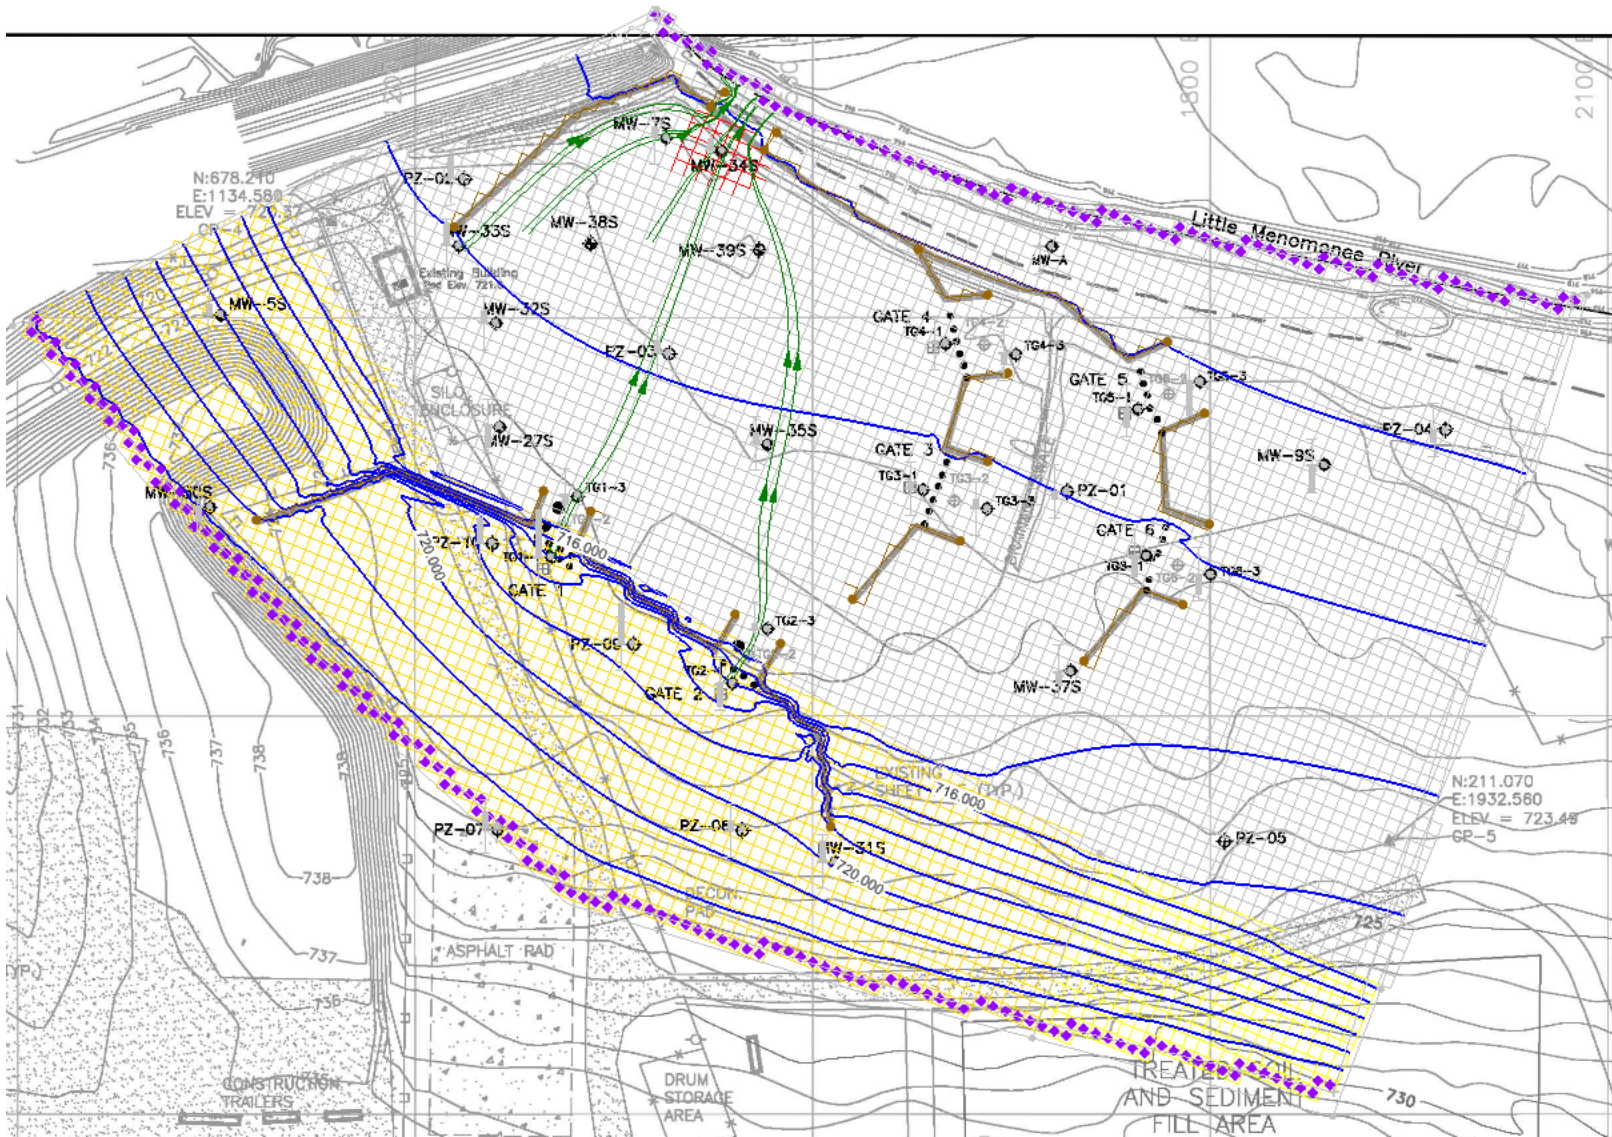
New Gate North of MW-34S, Excavation at MW-34S
